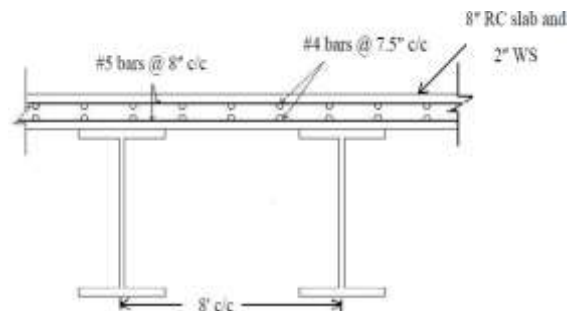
Cross section of reinforced concrete deck slab for truck way
